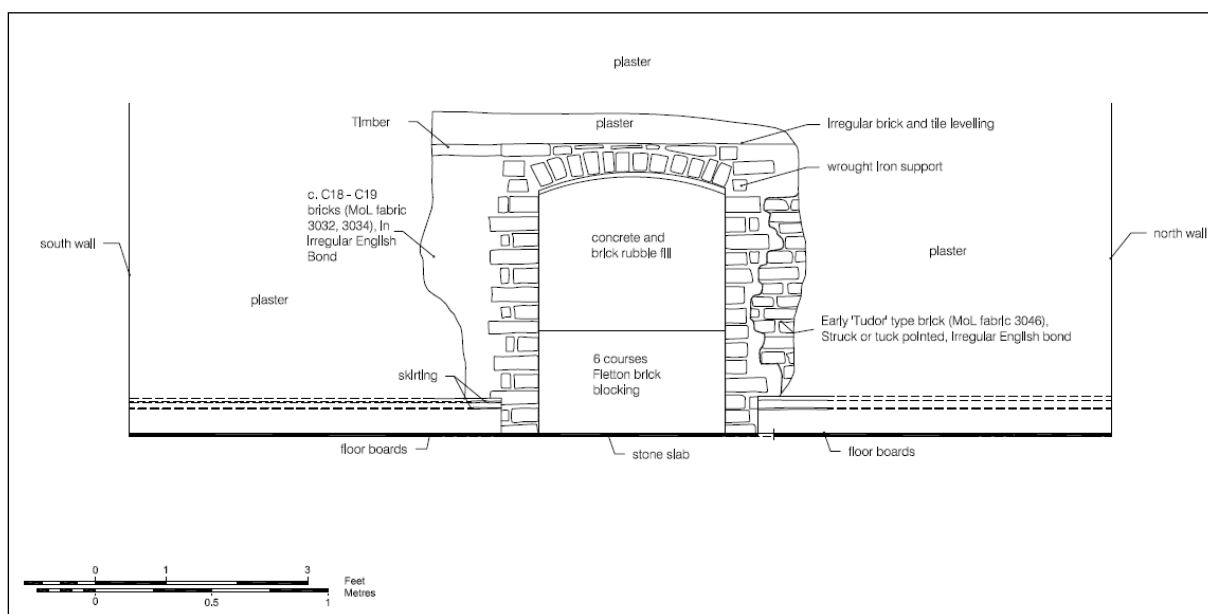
Room 231, west internal elevation, early brickwork and blocked fireplace revealed
